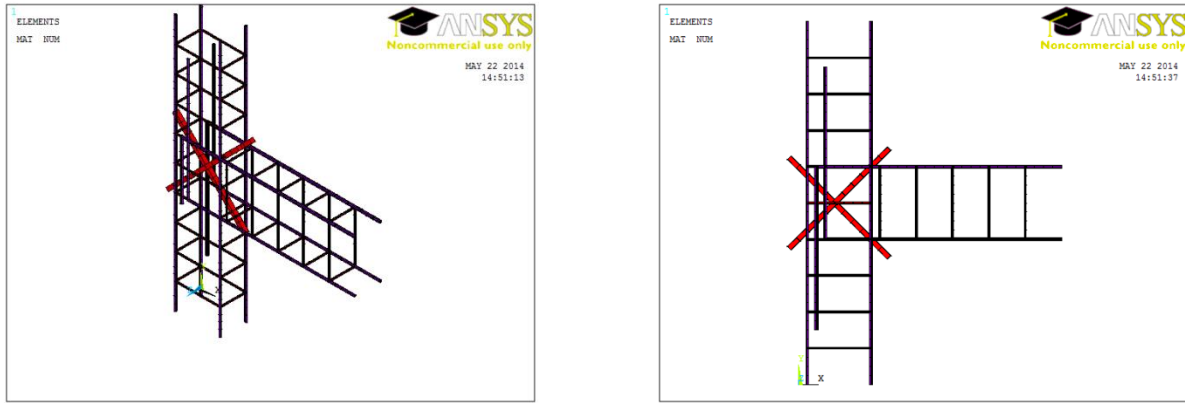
Reinforcement Modelled for the Exterior Beam-Column Joint D1
